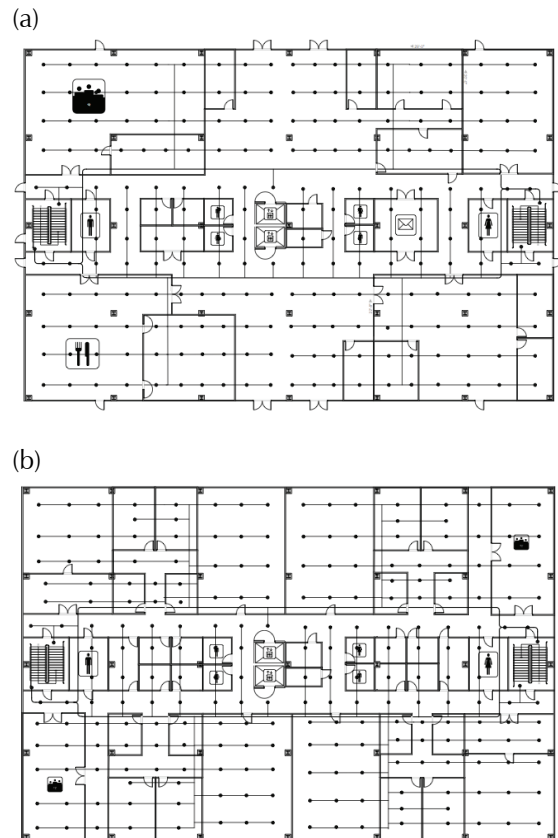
Automatic sprinkler piping systems for (a) floor two (the ground story), and (b) floors three through five (from Haselton et al. 2008).
